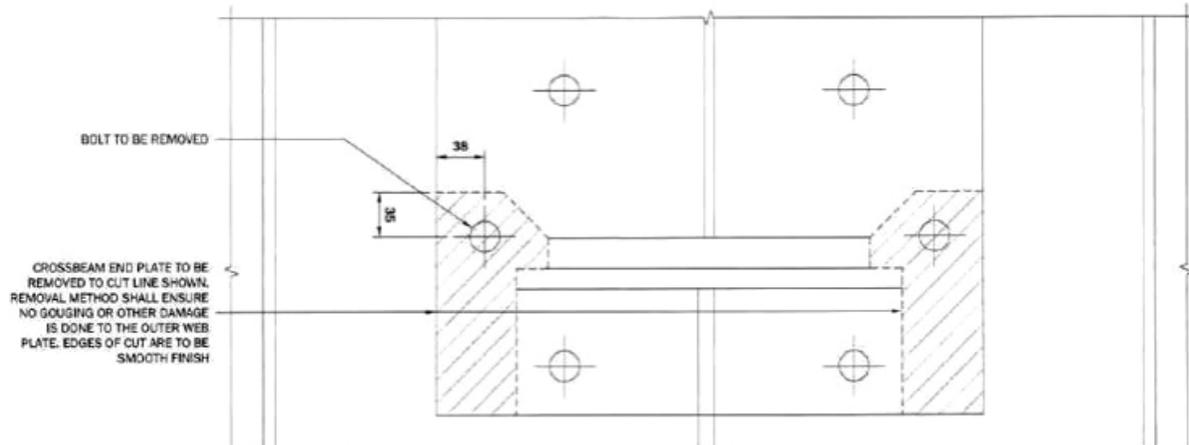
Engineering drawing of the end plate with instructions on how to remove it safely.
